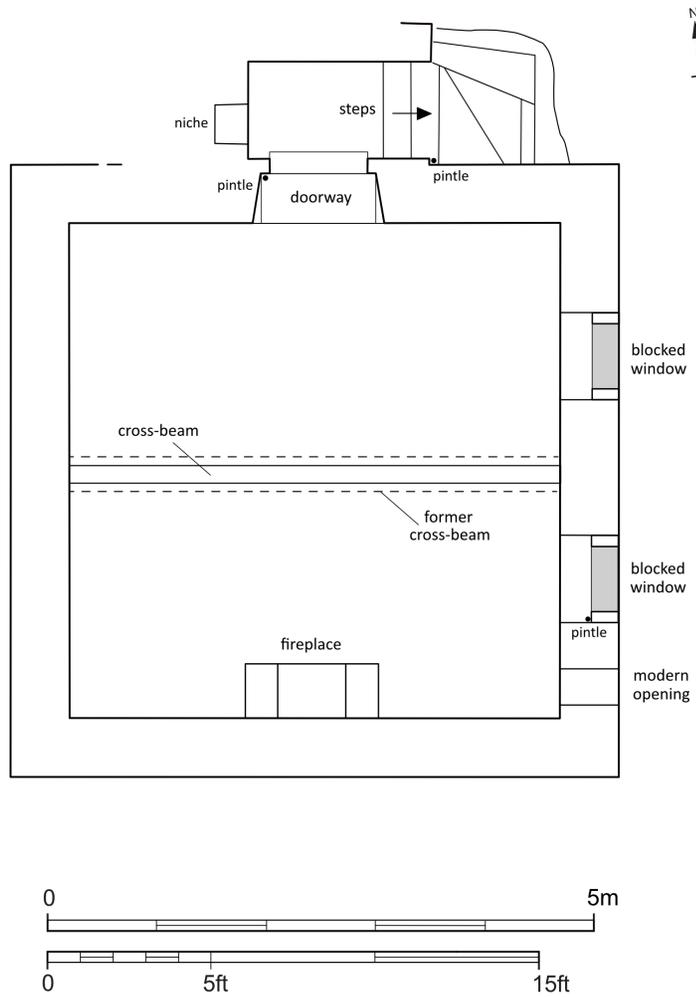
Bridge Cottage, Cromford: Plan of the basement area. Scale 1:50.
